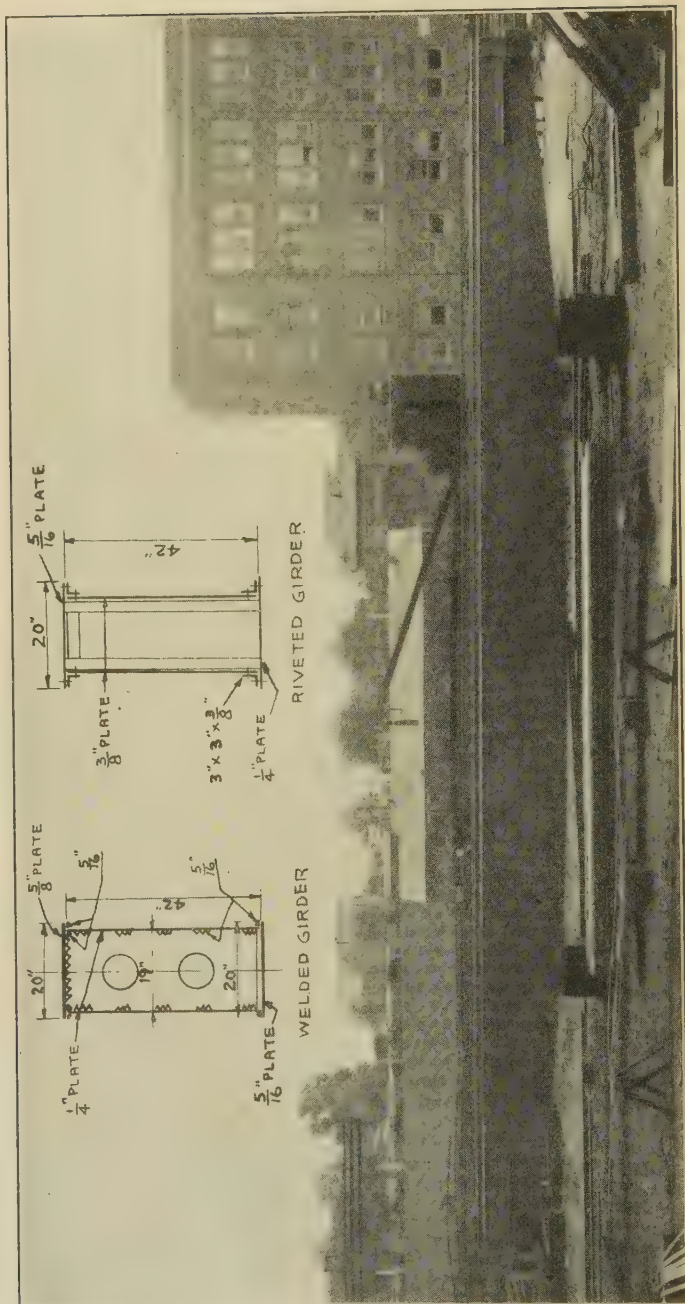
Arc-welded 10-ton 50-ft.-span crane girder for foundry cleaning room.
